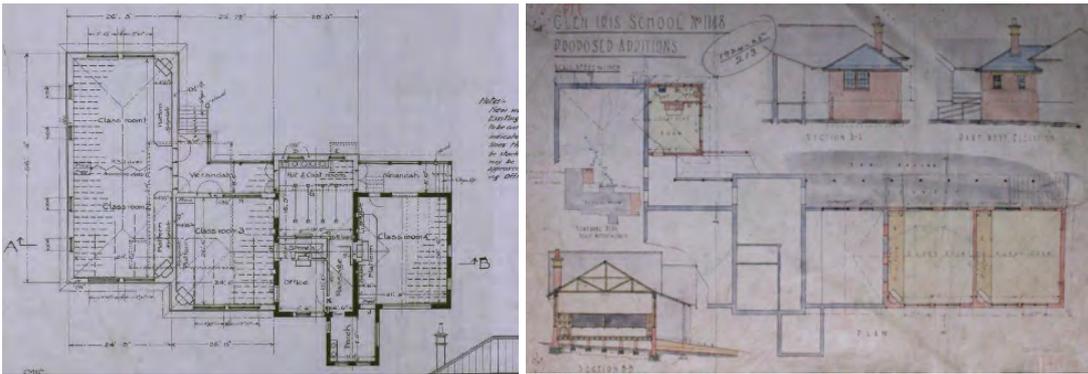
The initial plan prepared for the 1924 addition on the south side (left) and the amended plan with extra rooms (right). The area shaded light yellow on the floor plan on the right-hand side shows the further additional rooms to the north side. (Source: PROV VPRS 3686/P7/482 & VPRS 3686/P7/482)
